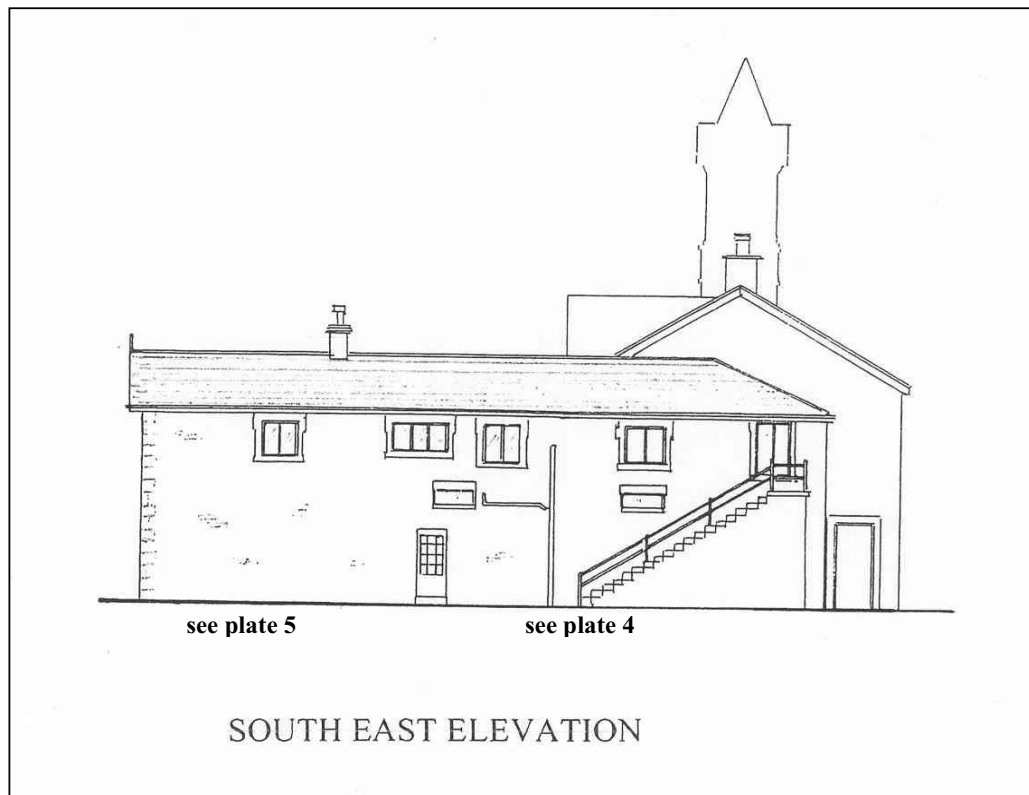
The Stable Block: South-East Elevation. Scale: 1:200
